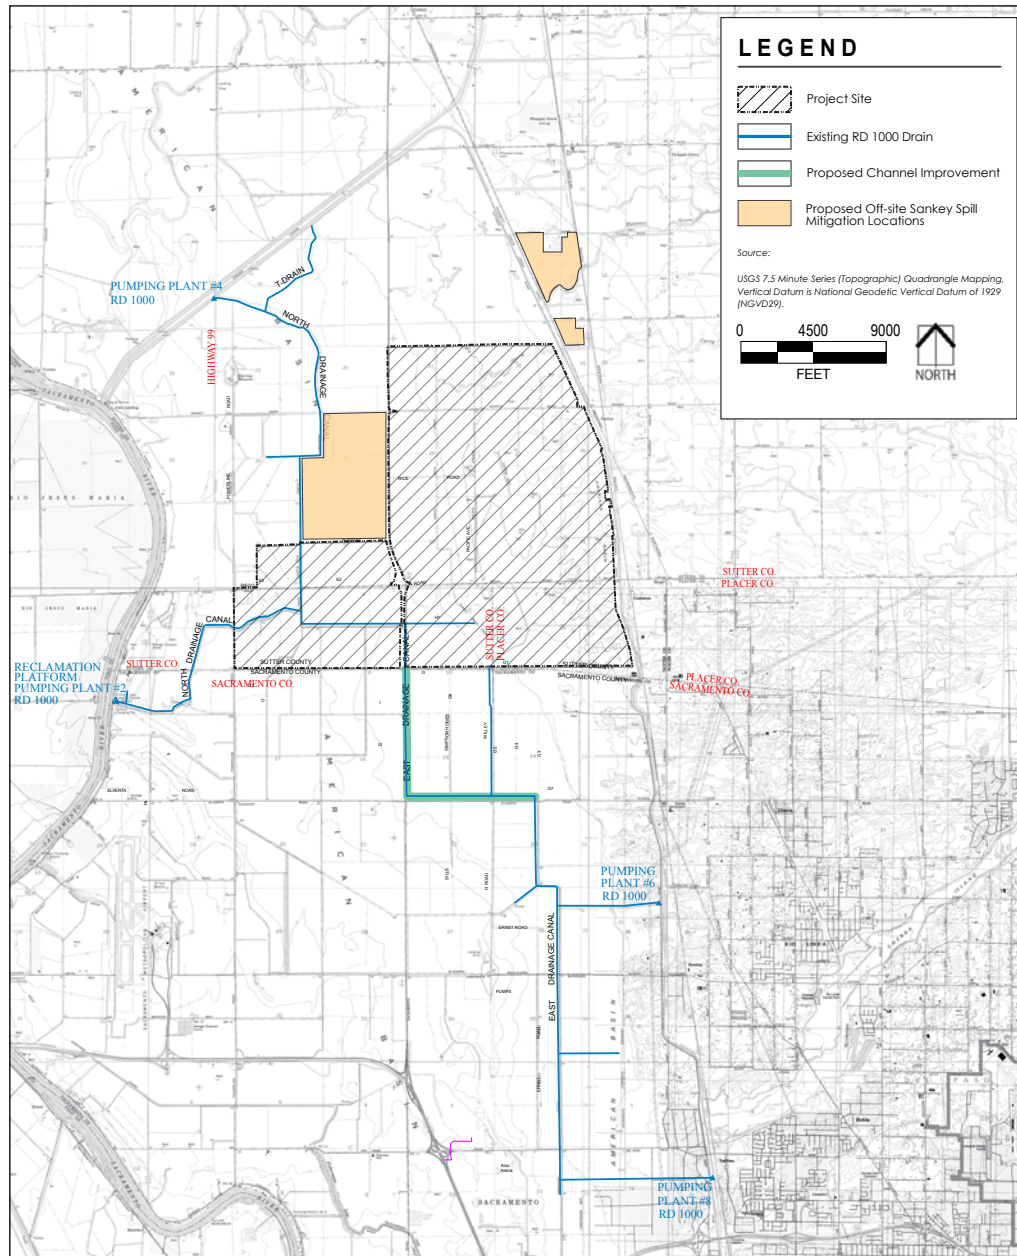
Backbone Drainage Plan (Off-site)
